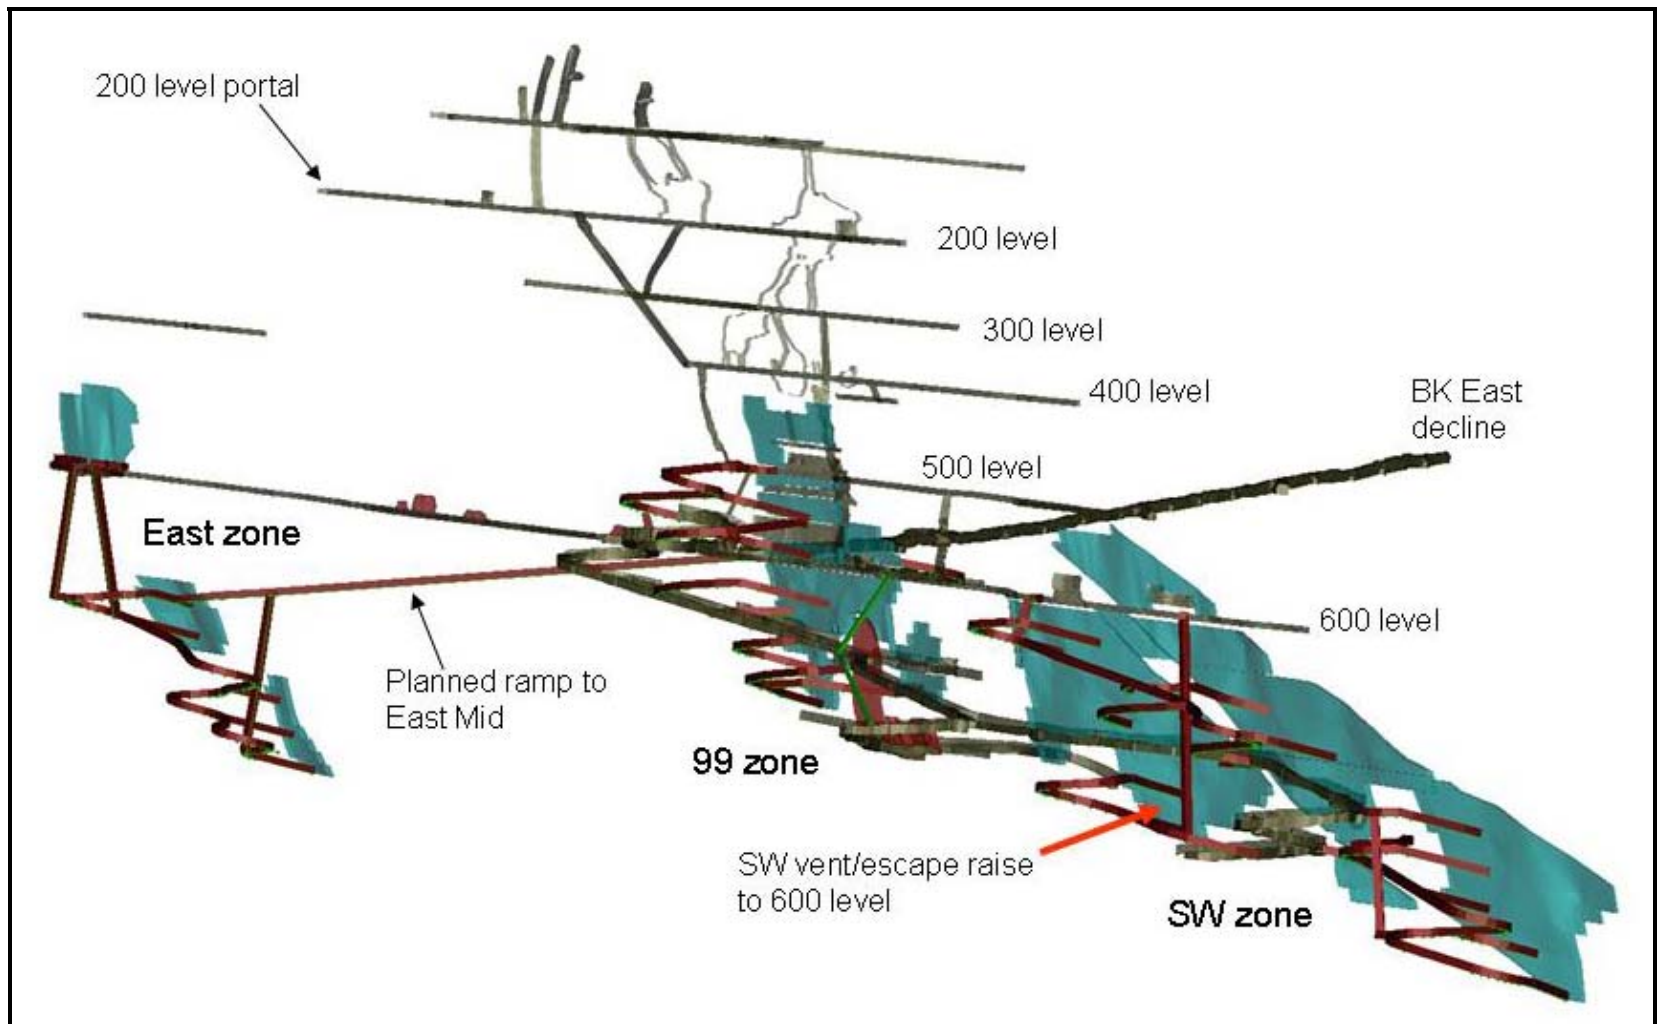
3D View of Mine Workings looking NE from the footwall side
